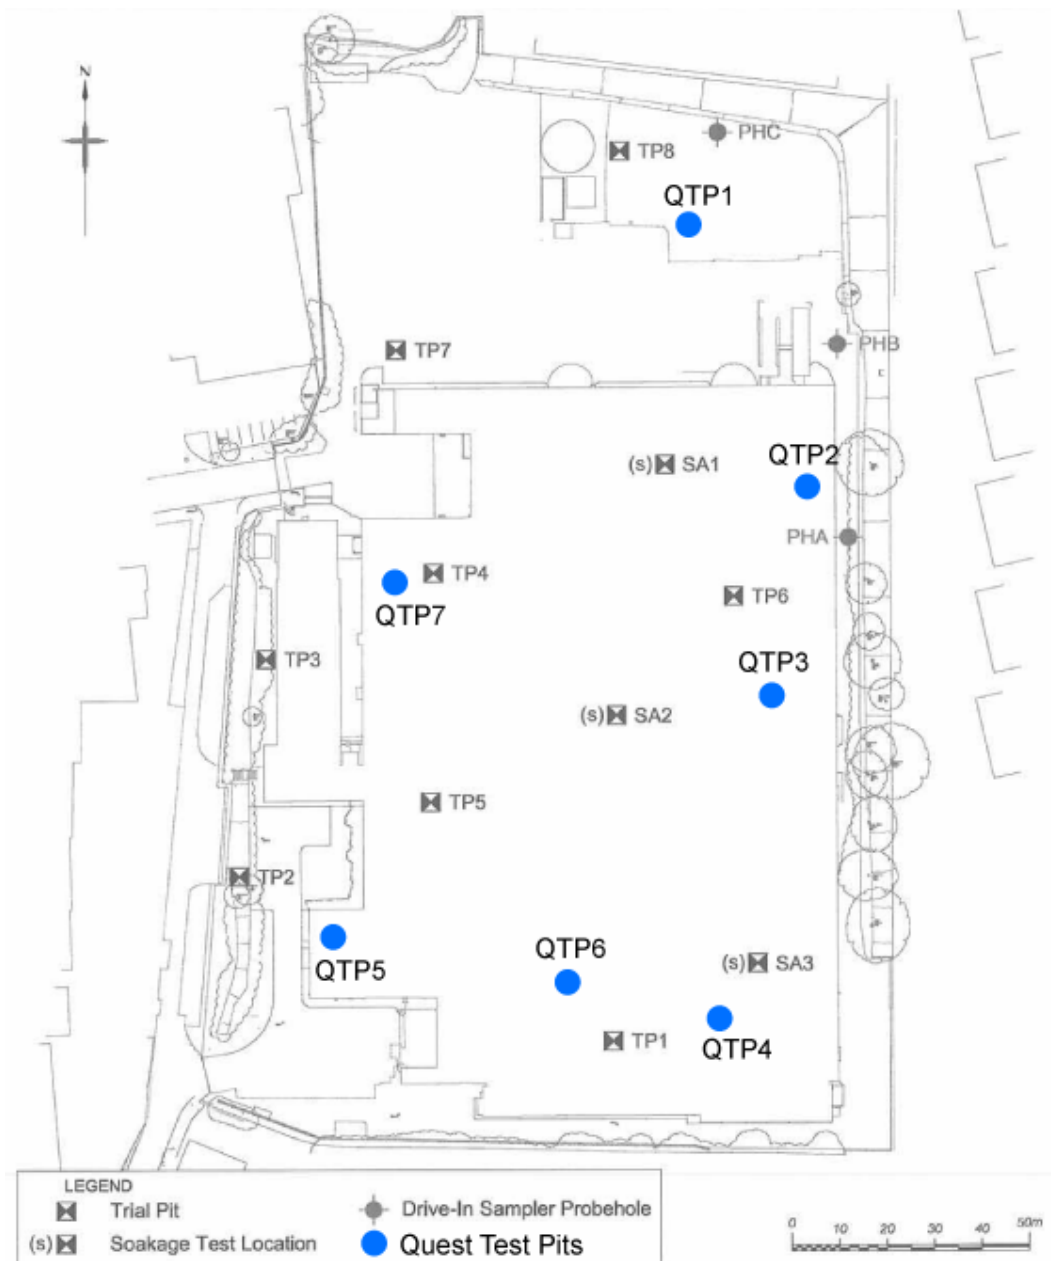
Site map incorporating the location of previous geotechnical Test Pits, and new Quest Test Pits at the Polestar Site, St Peters Road, Maidenhead. Original figure provided by CgMs Consulting (Smith, 2012)
